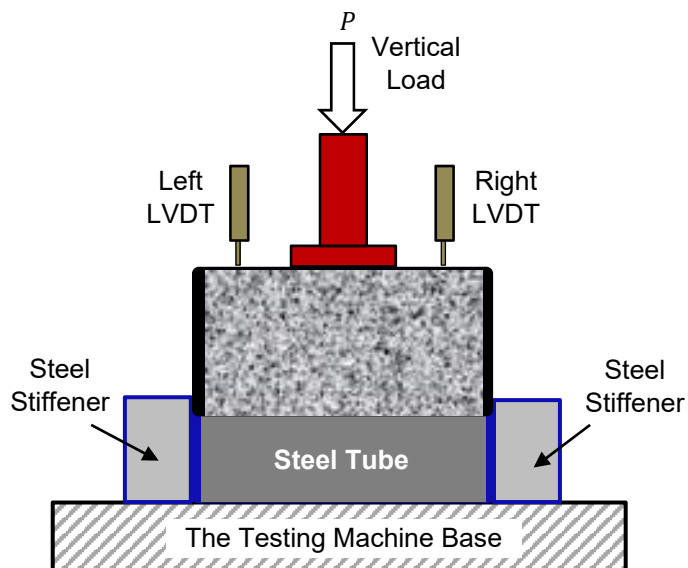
Typical Specimen and Method of Load Application in a 60,000-pound Baldwin-Lima-Hamilton Test Machine
